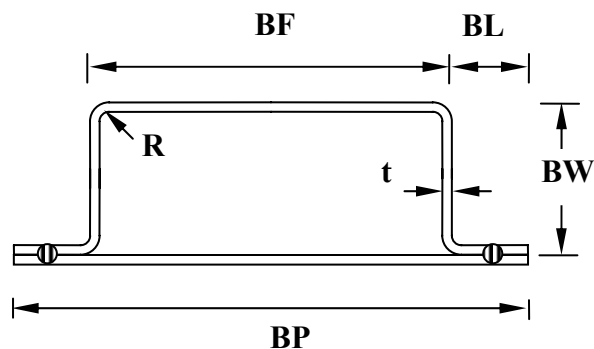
Cross sections of beams fabricated from 25AK and 50SK sheet steels
